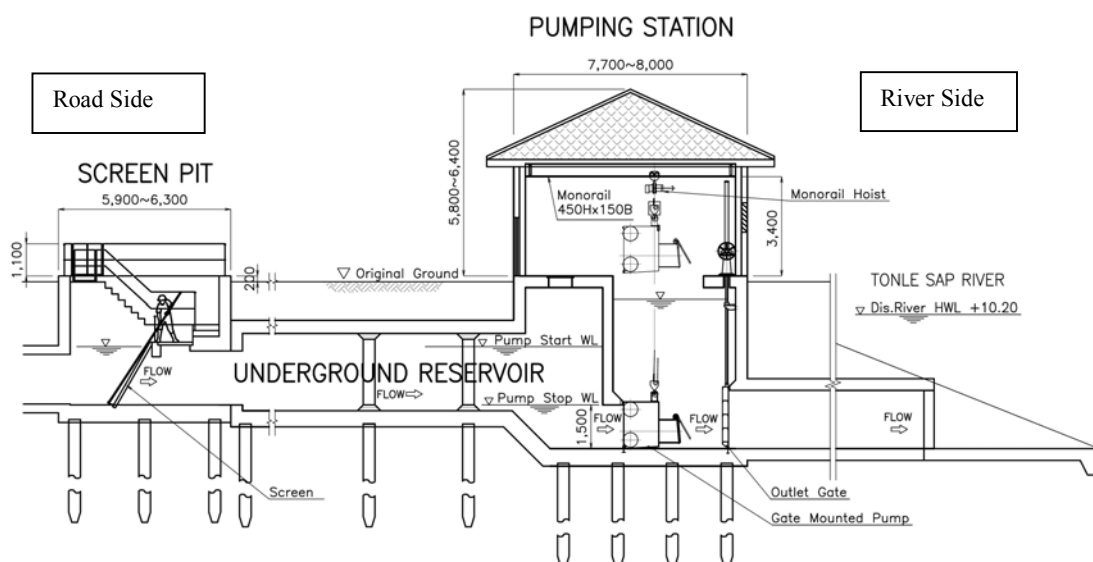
Layout Image of Pumping Station and Underground Reservoir
